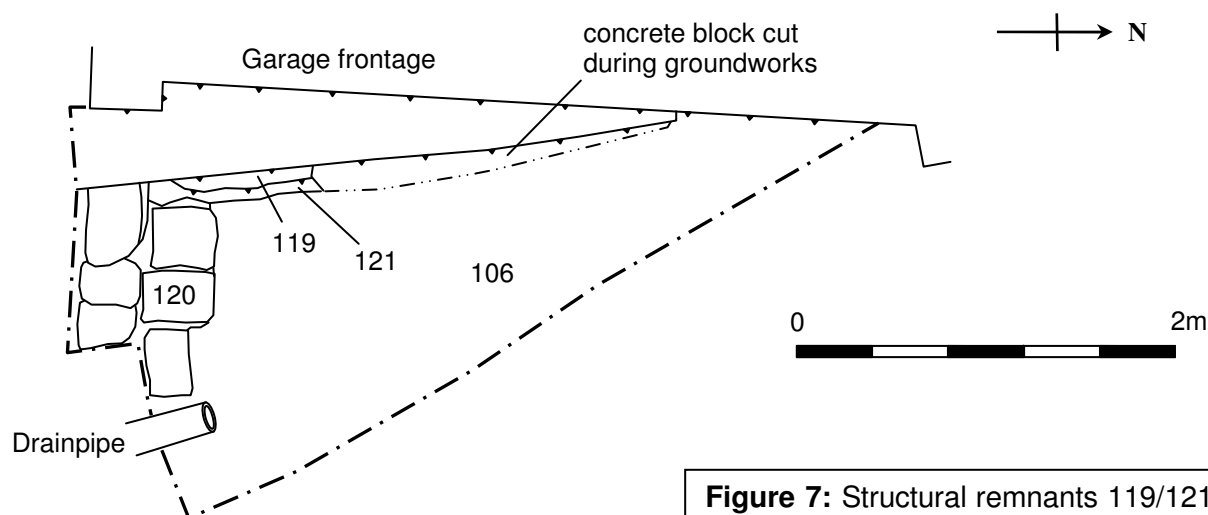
Structural remnants 119/121 and 120 in a service trench adjoining the existing garage, at scale 1:40.
